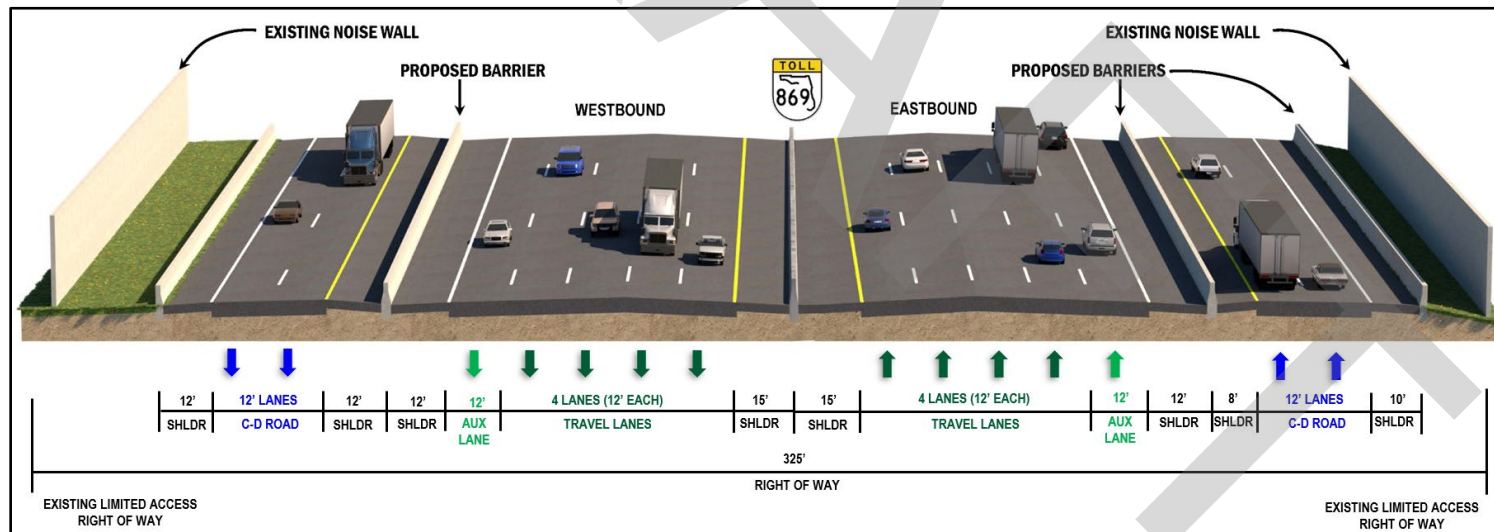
Preferred Alternative Roadway Section between US 441 and Lyons Road
